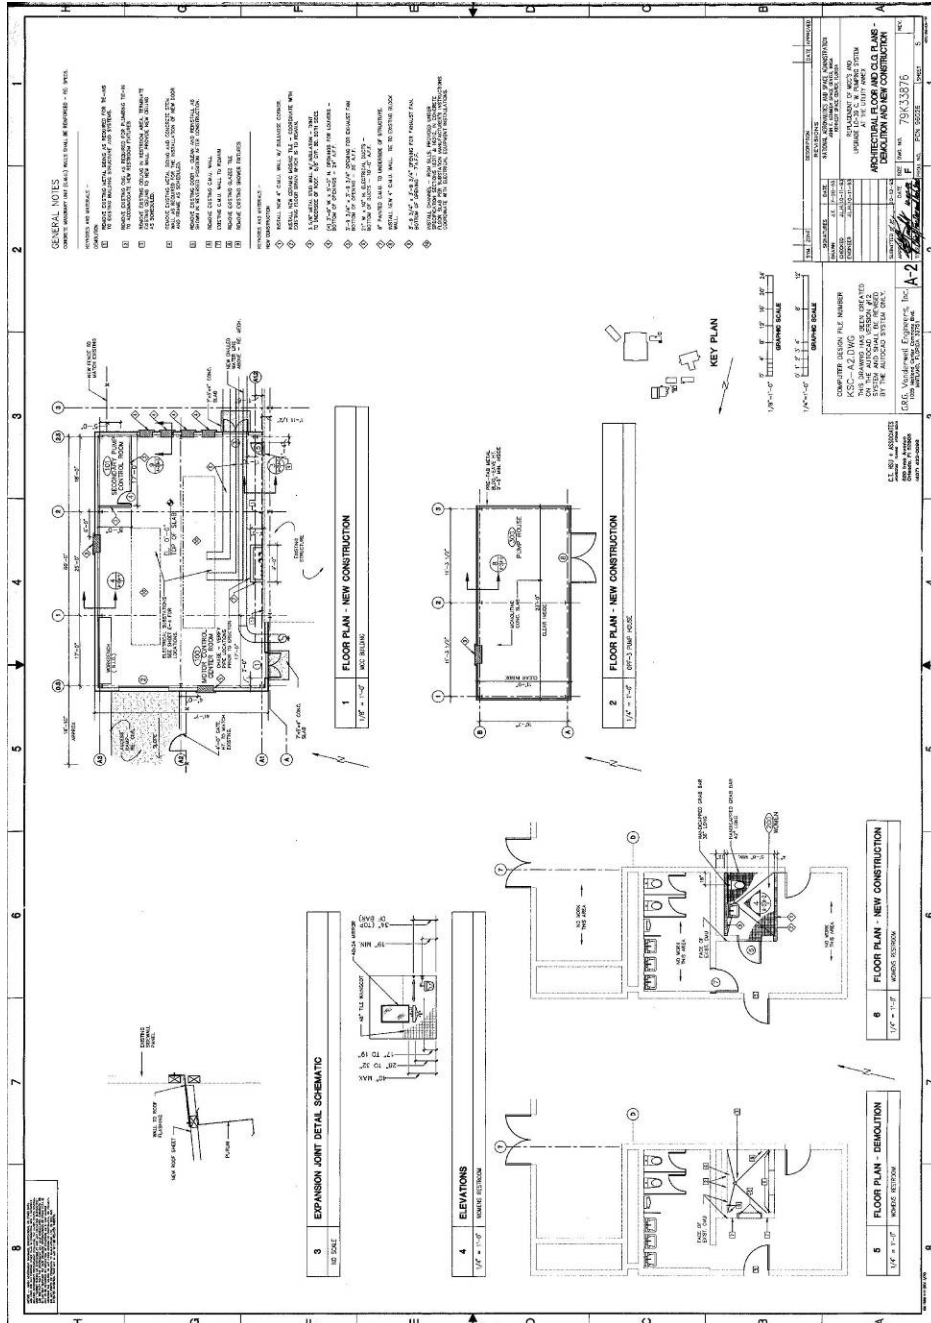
G.R.G. Vanderweil Engineers, "Replacement of MCC's and Upgrade LC-39 C.W. Pumping System at the Utility Annex," Architectural Floor and Clg. [Ceiling] Plans-Demolition and New Construction, October 1993, Sheet 5.
